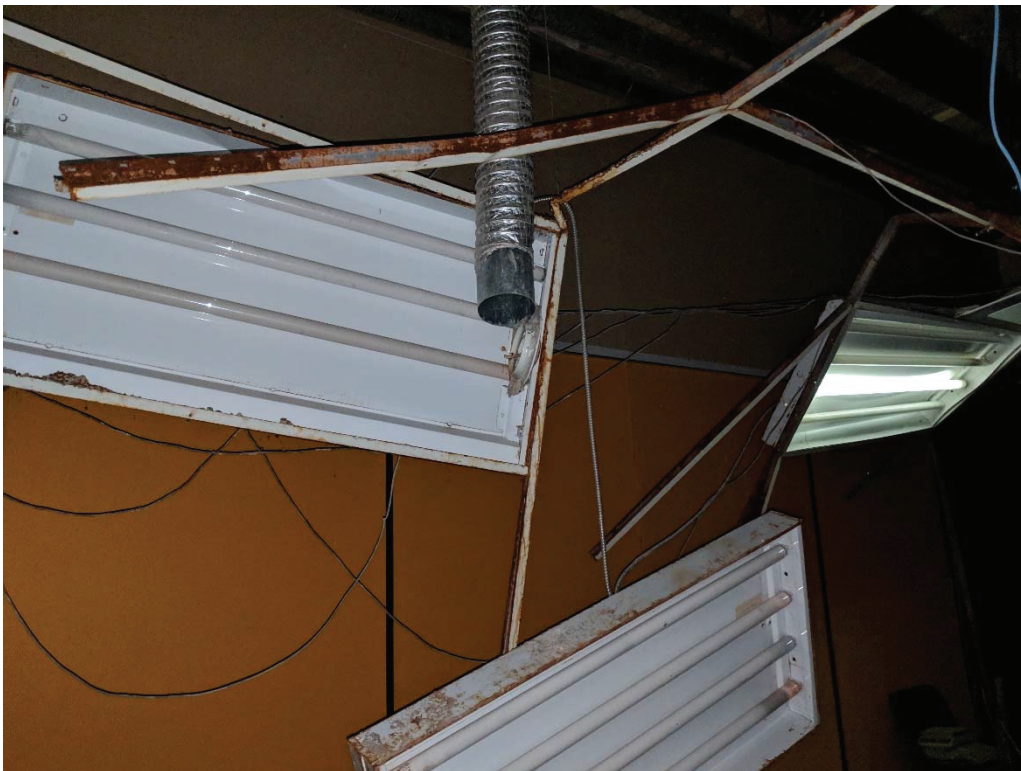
Main floor broken suspended ceiling support and glowing fluorescent lights
